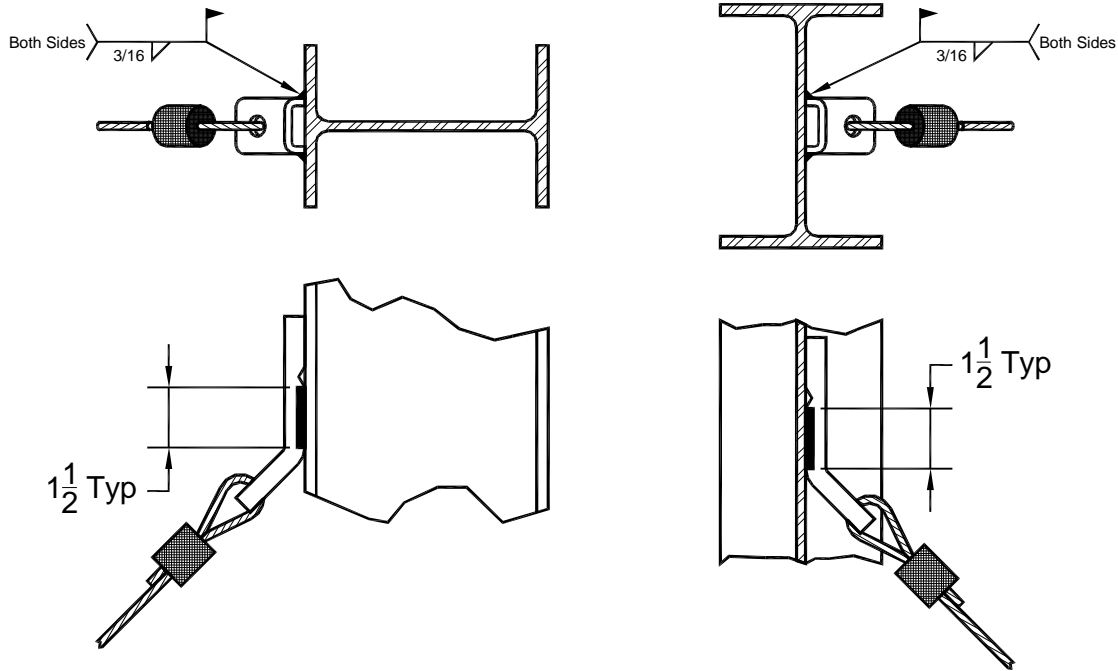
; KSCA Bracket Welded to Structural Steel in Orientation 2
